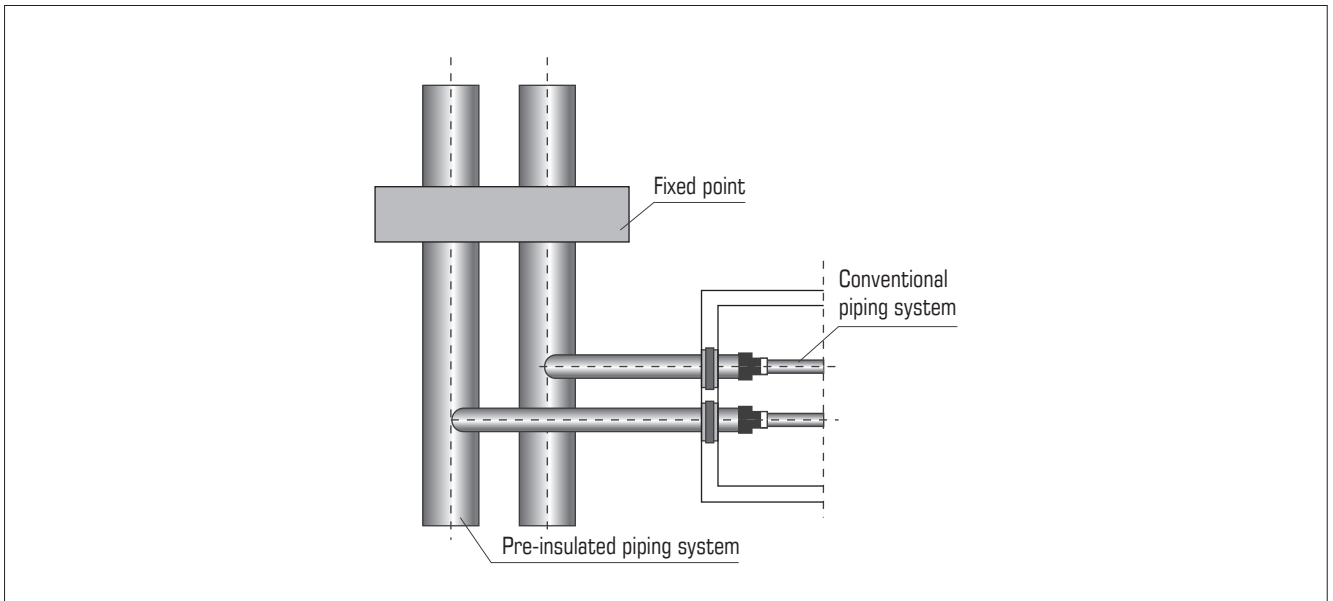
Constructing a branch pipe towards a conventional piping system from a pre-insulated piping system
